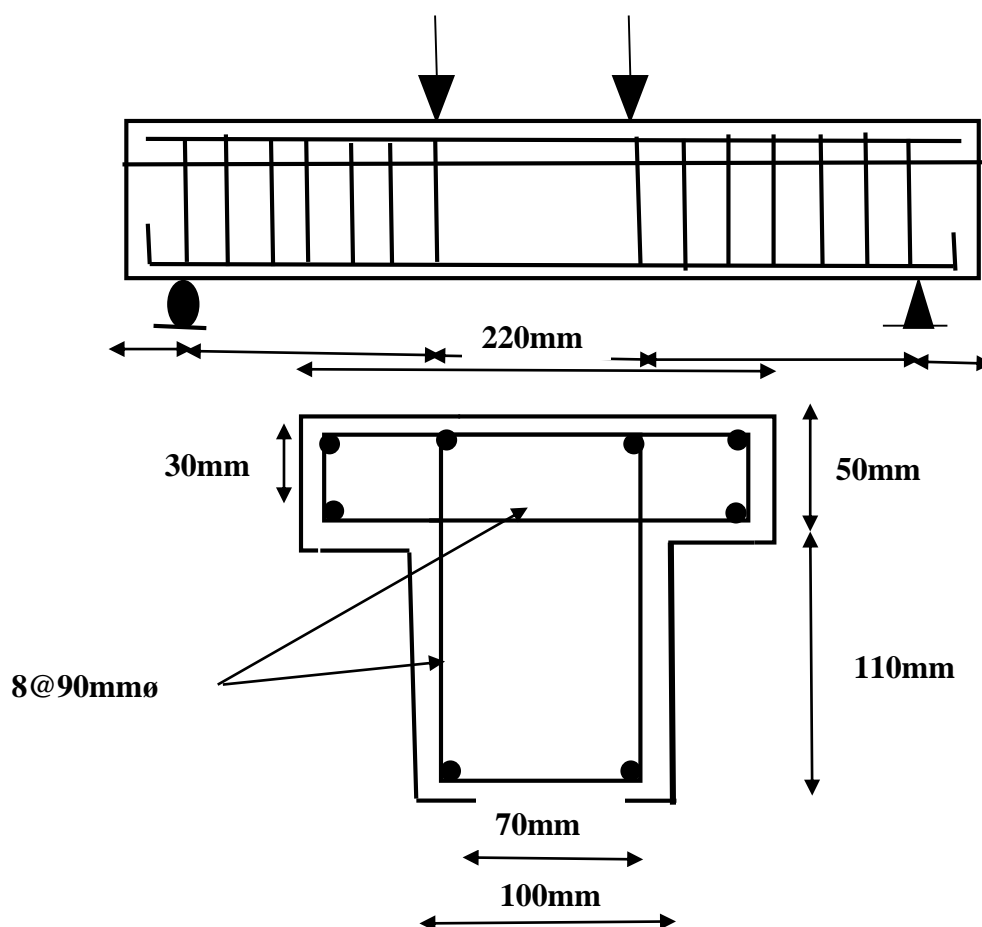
Details of cross-sectional dimensions and reinforcement of beams (Normal, RPC1, RPC2 and RPC3).
